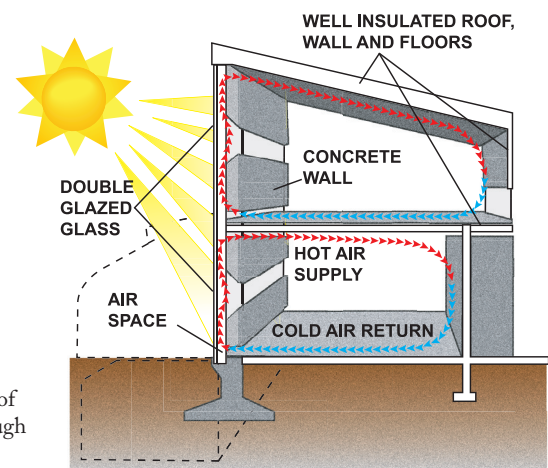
Indoor/outdoor temperatures and schematic of passive solar system—Kelbaugh House, Princeton, NJ.
